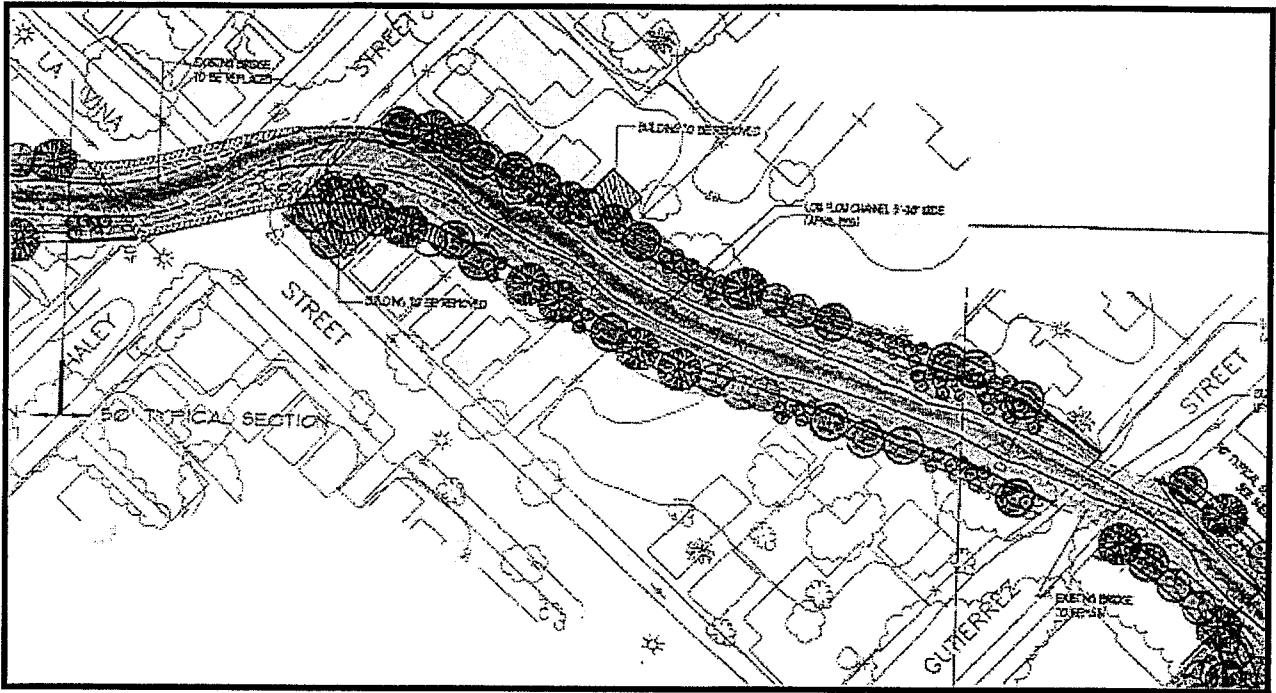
Haley-De la Vina Bridge to Gutierrez Street Bridge
